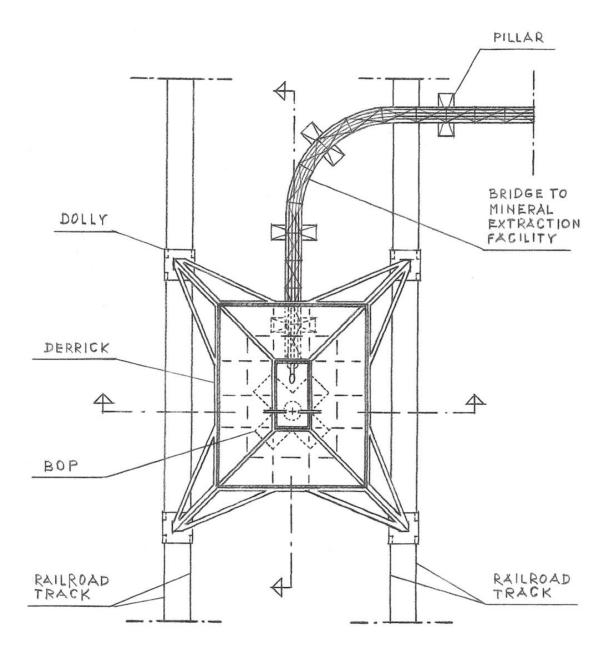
Plain Cross-sectional View of an Apparatus for Drilling Faster, Deeper, and Wider Wellbore
